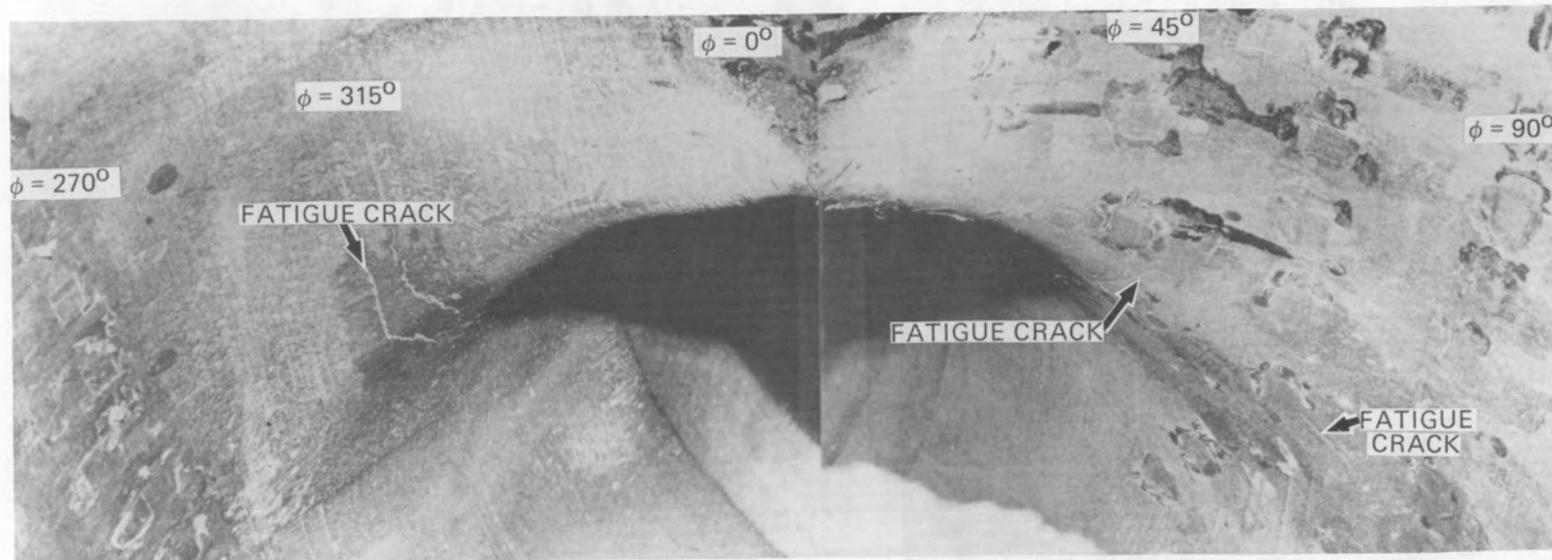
View of inside surface of T-4 after fatigue testing.
